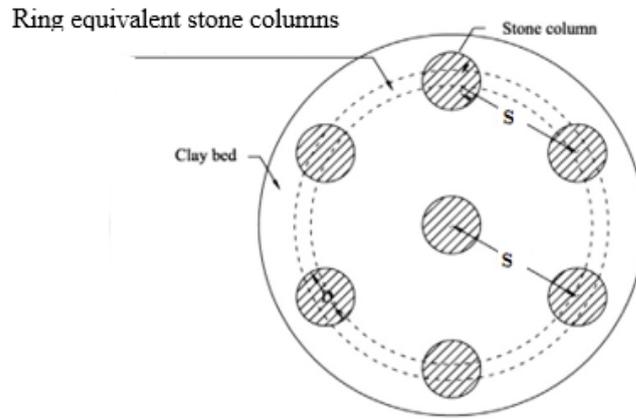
Modeling groups of stone column (six stone column and central column) (12)
